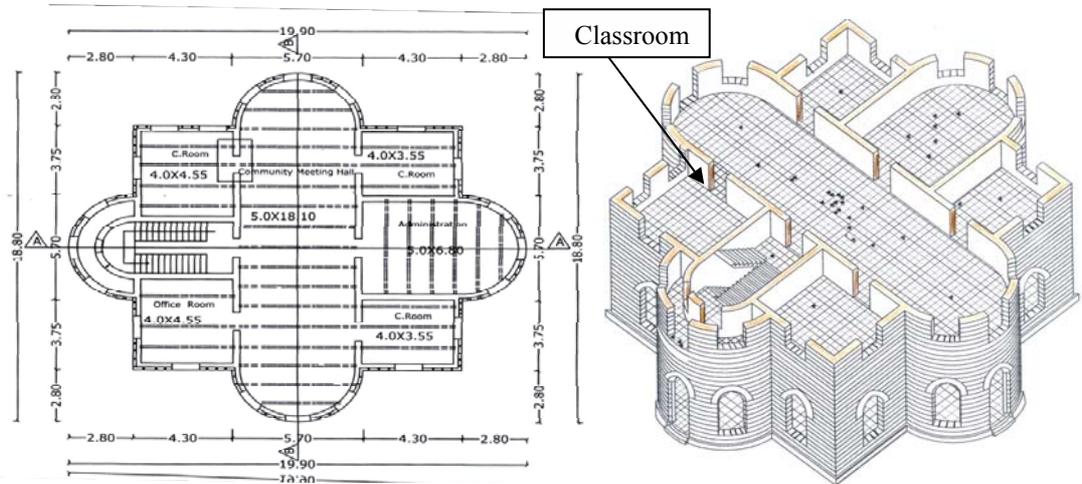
Left: plan of the first floor; right a 3D view of the first floor before rehabilitation.
